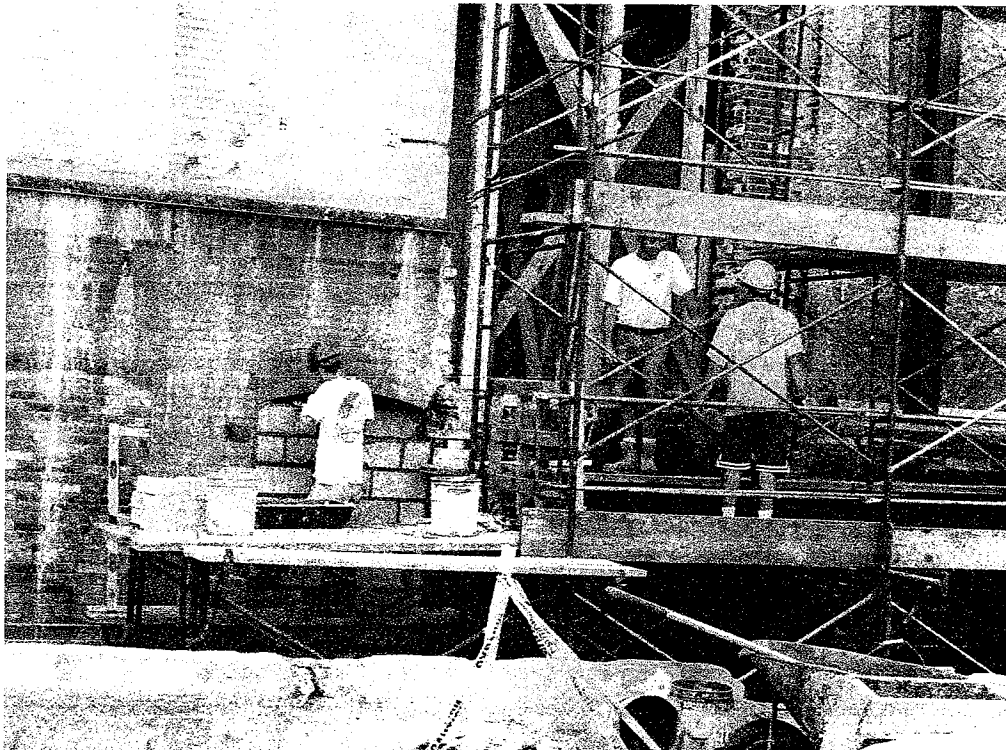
Infill of existing hole in basement brick foundation wall at grid F/7
